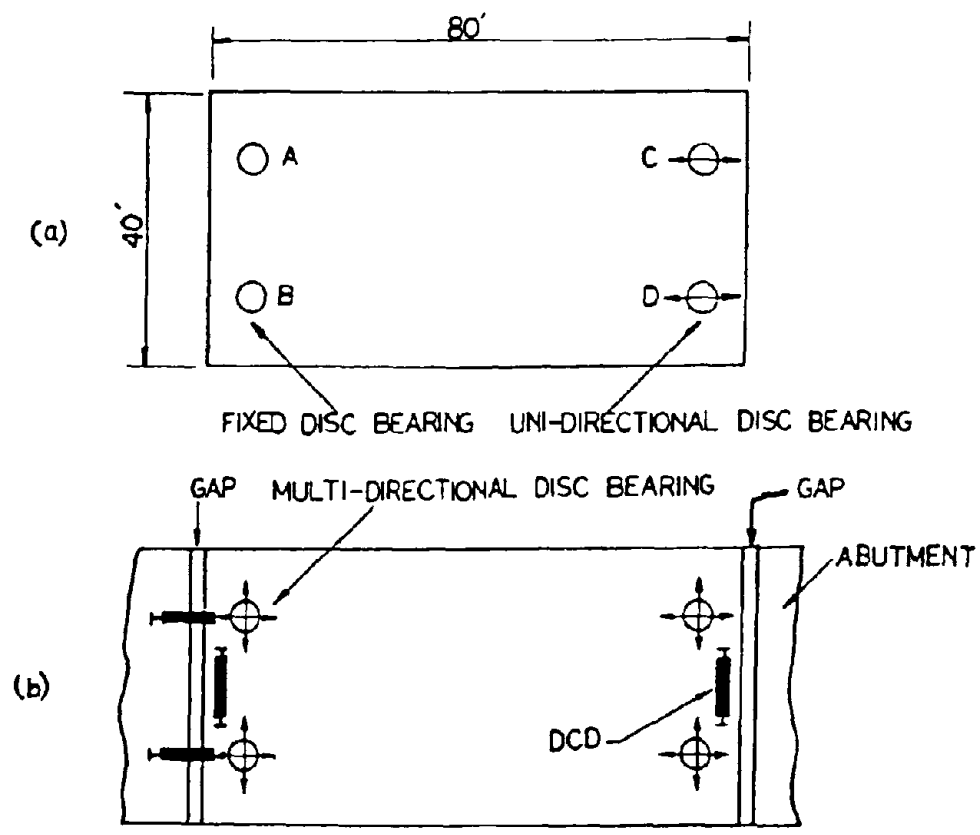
Single Span Bridge on Sliding Bearings (a) Conventional Bridge (b) Base-isolated Bridge.
